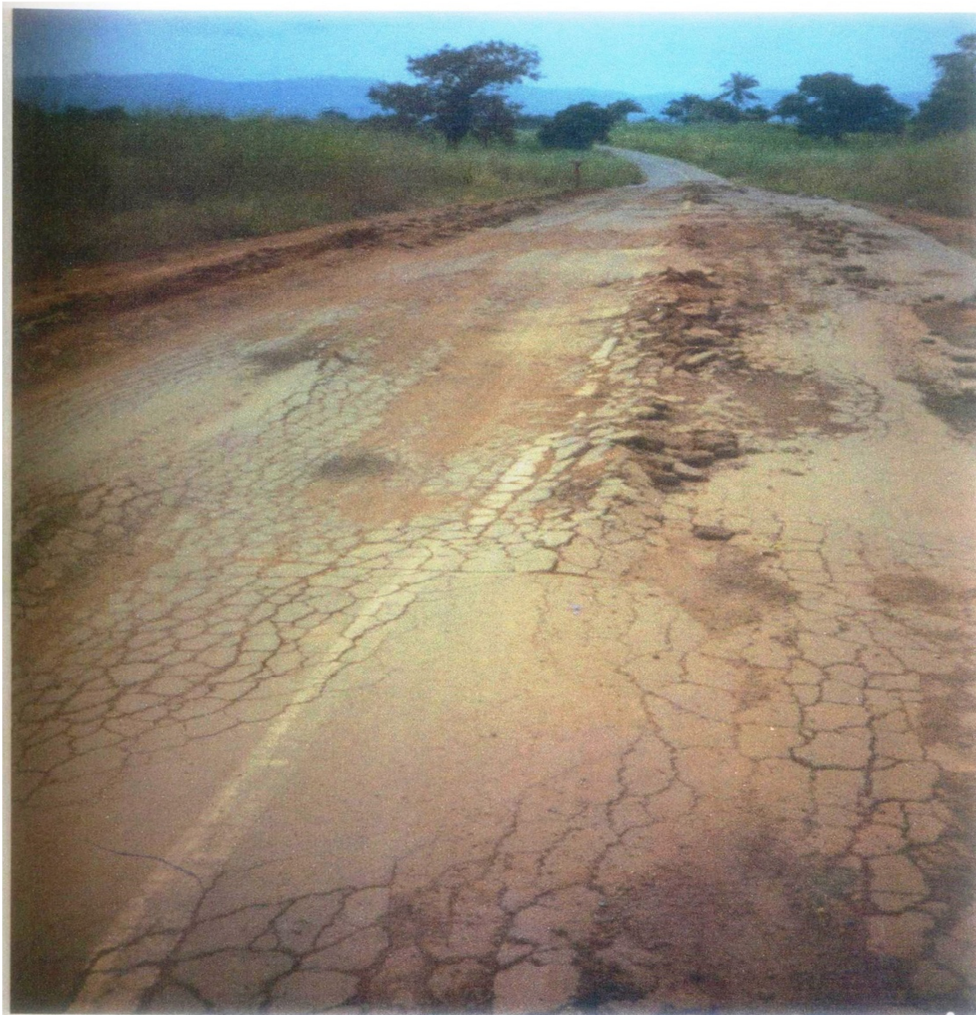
Longitudinal and polygonal cracks on a highway pavement at Awgu
